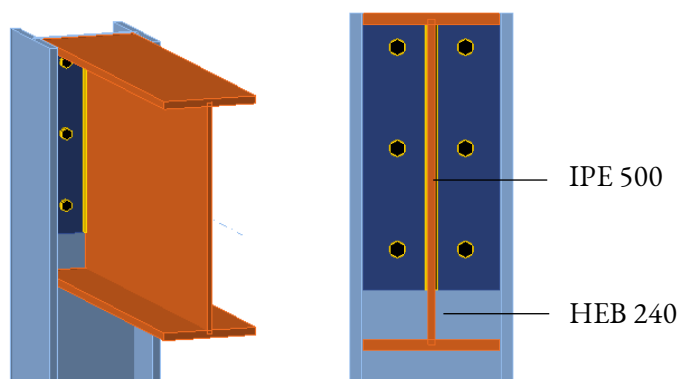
Example of a connection between the mezzanine primary beam and a mezzanine column
